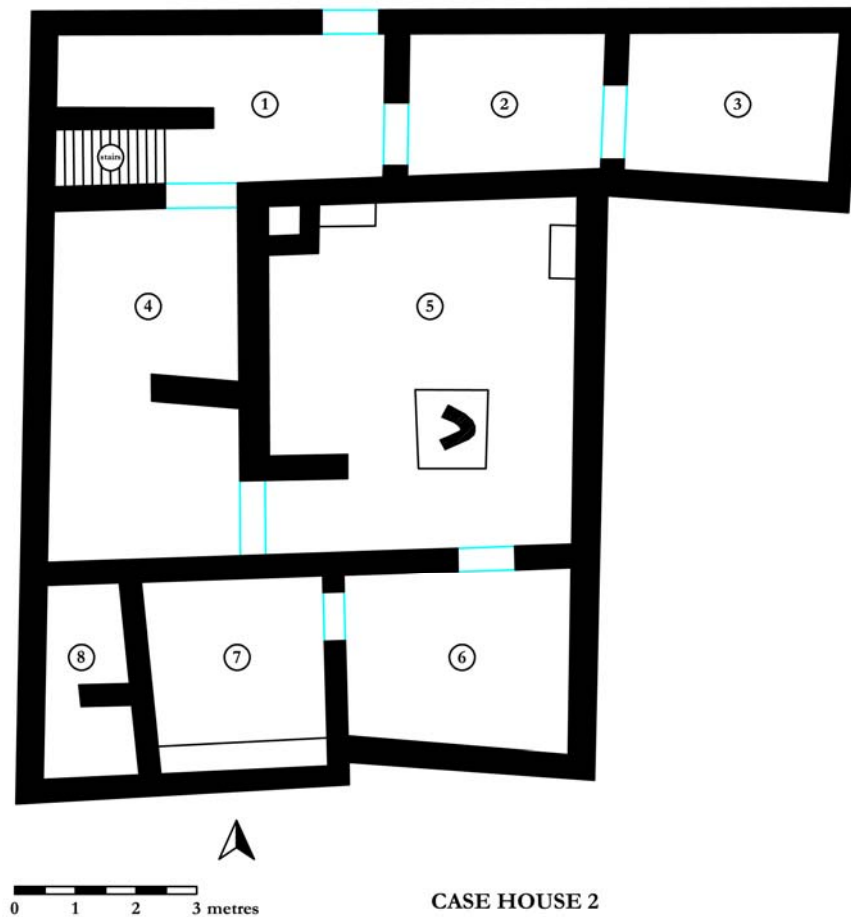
Plan of the merchant Šupi-akh-šu's house; Case House 2. (After T. Özgüç 2005, 58.)
